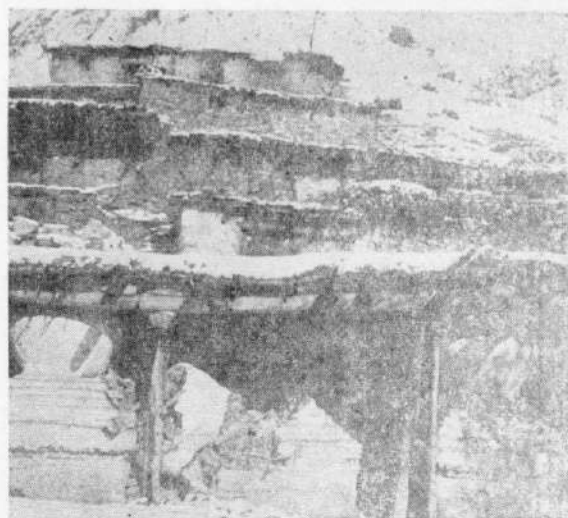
Damage to 'Mane' and stone masonry houses at Leo village. The houses show cracks at all five levels from the central 'Mane' in N-S direction.
